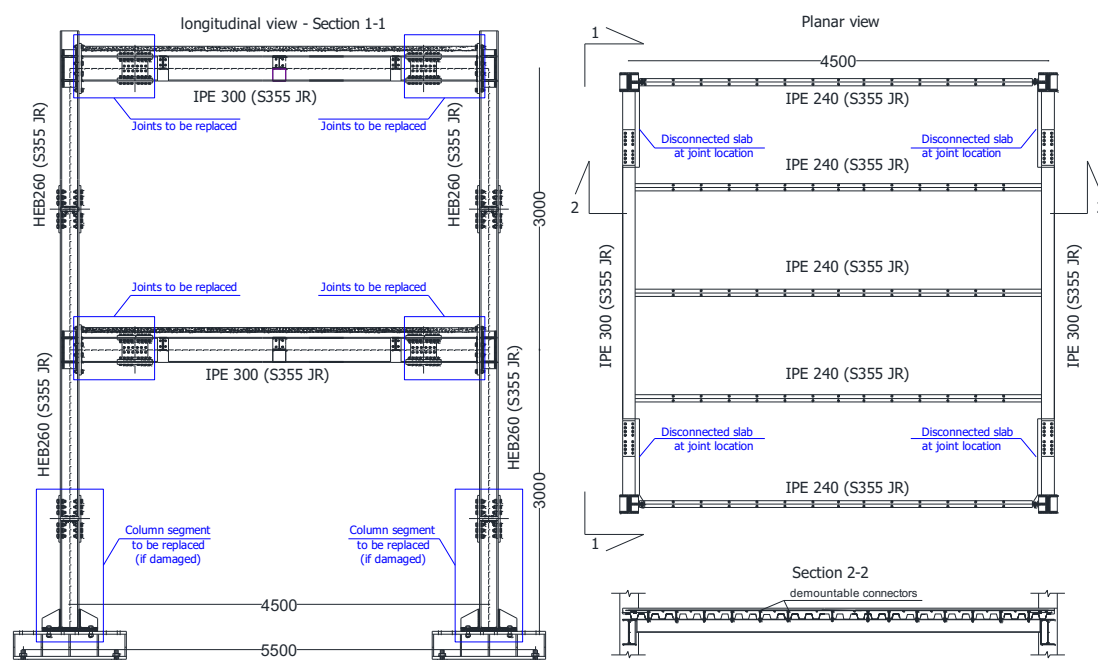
Structural layout of the mockup with detachable dissipative zones and detachable slab.
